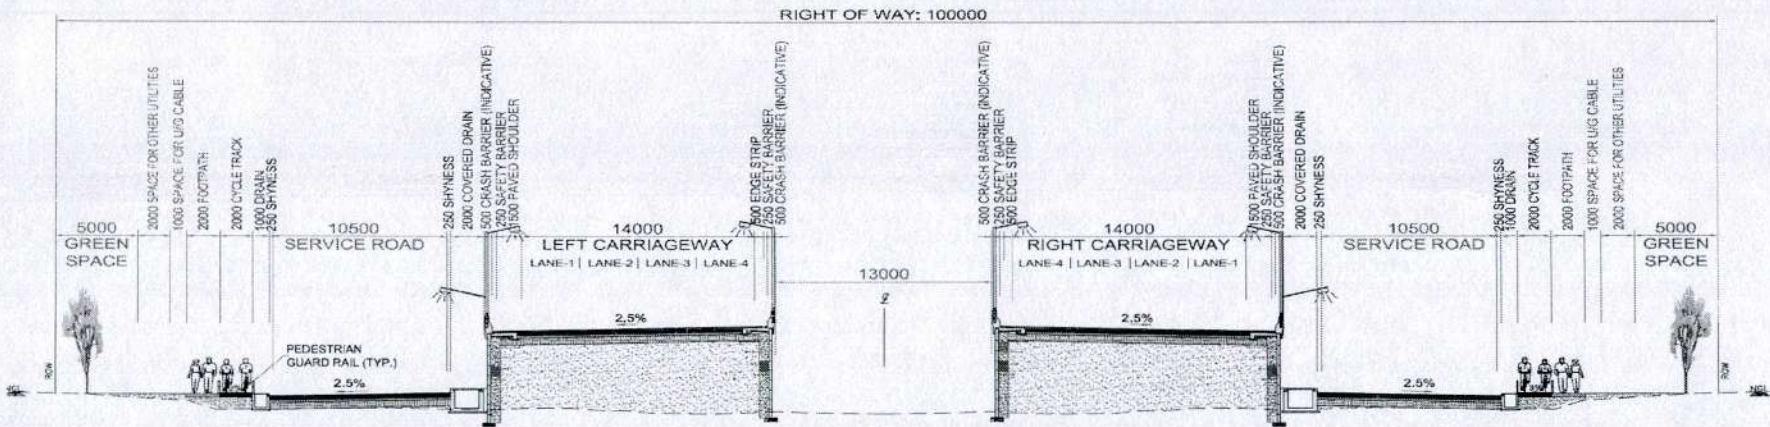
Typical Cross Section at VUP and PUP approaches
